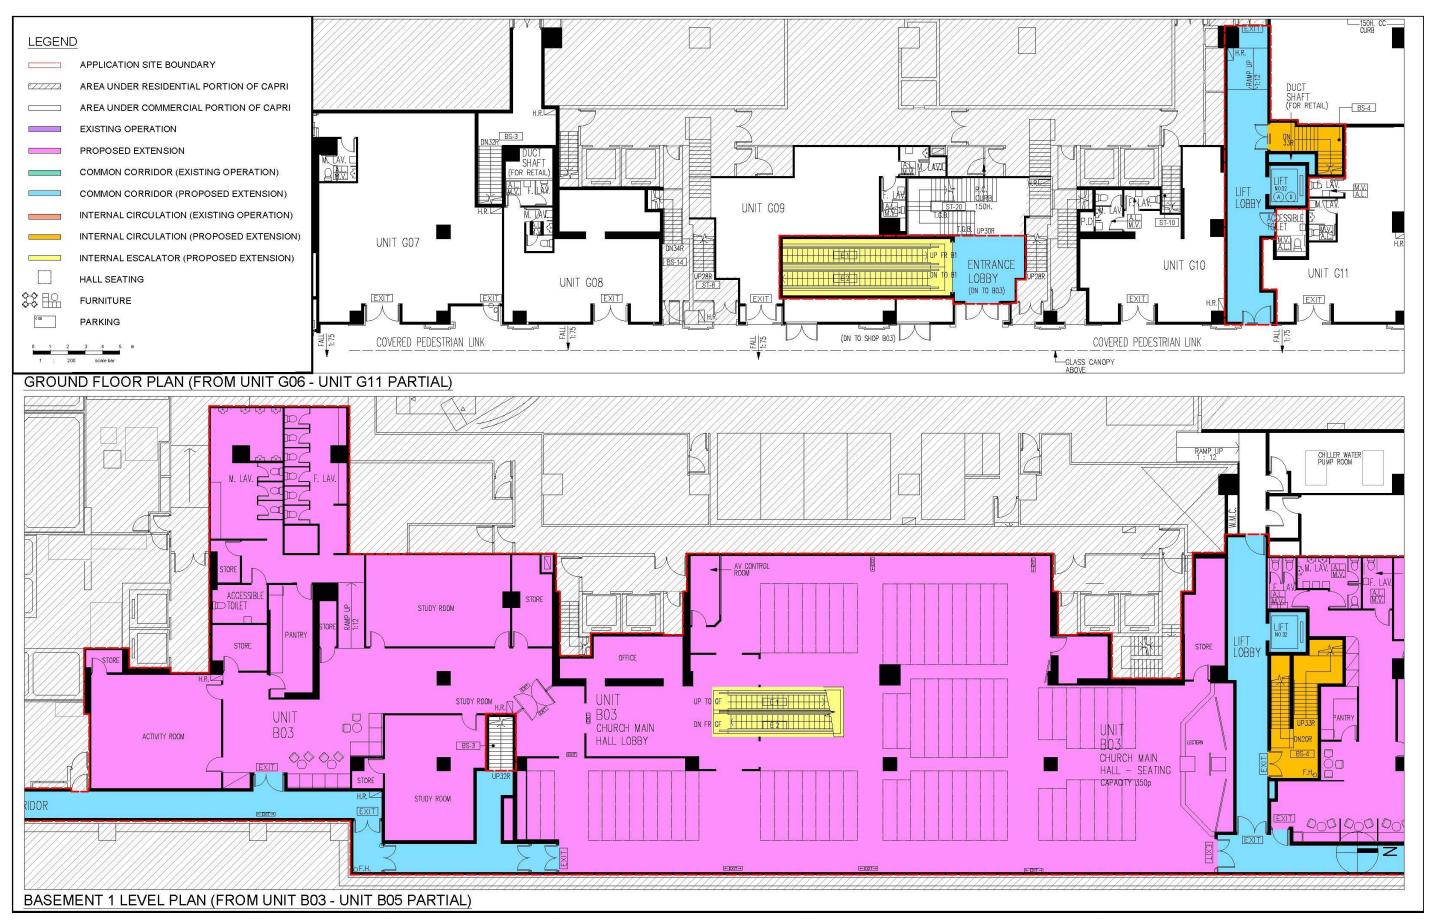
Proposed Uses at Central Portion of Ground Floor and Basement Level 1
